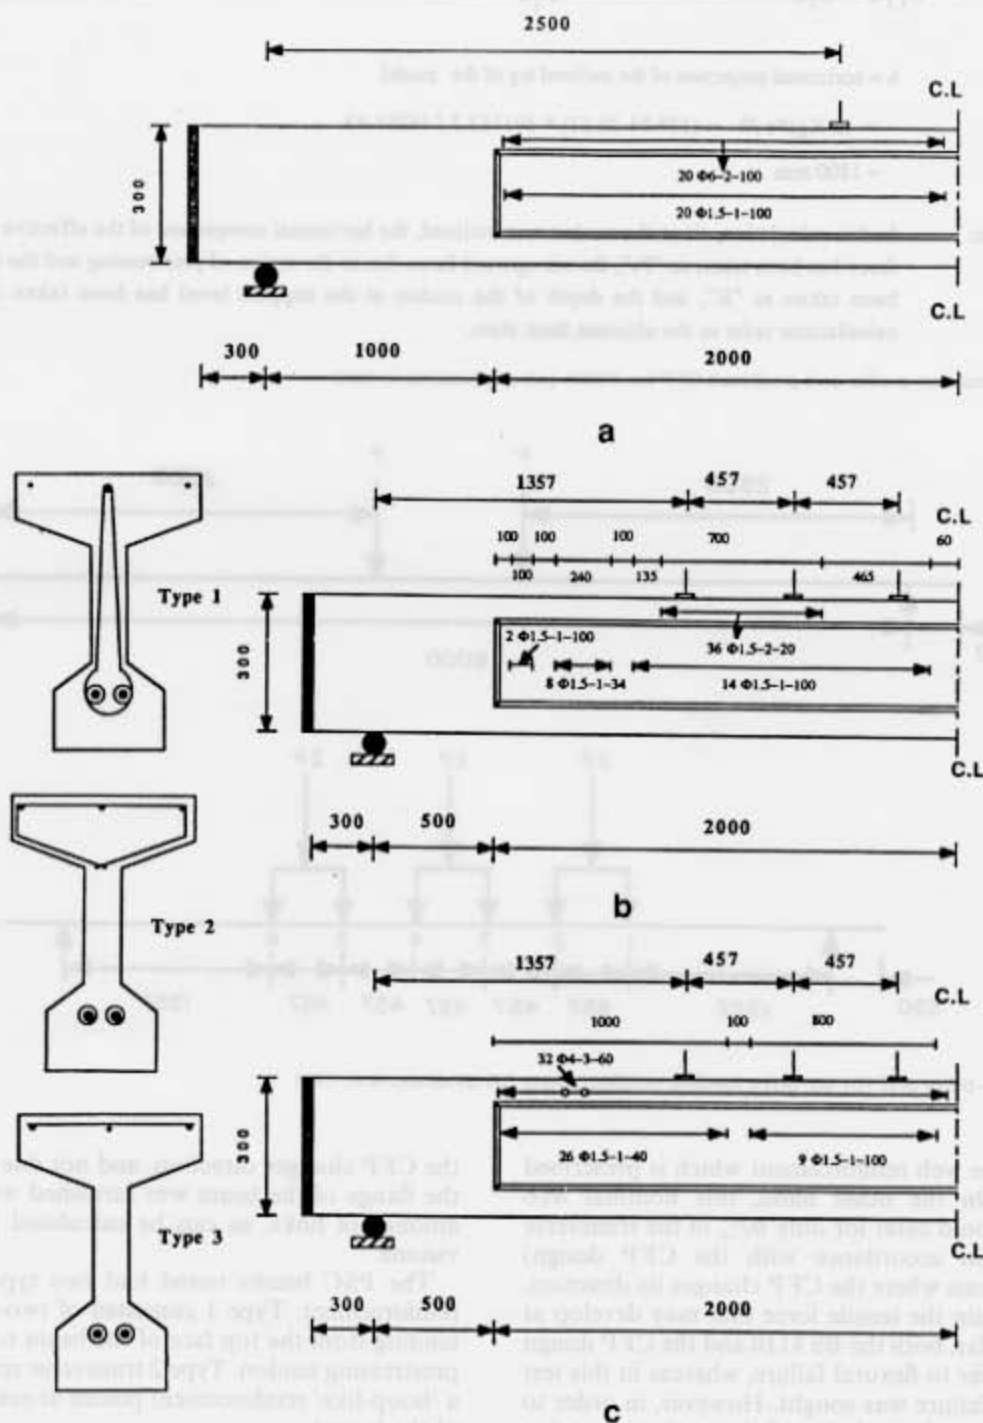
Transverse reinforcement details of (a) PCB1, (b) PCB2 and (c) PCB3 (all dimensions and bar sizes in mm)
